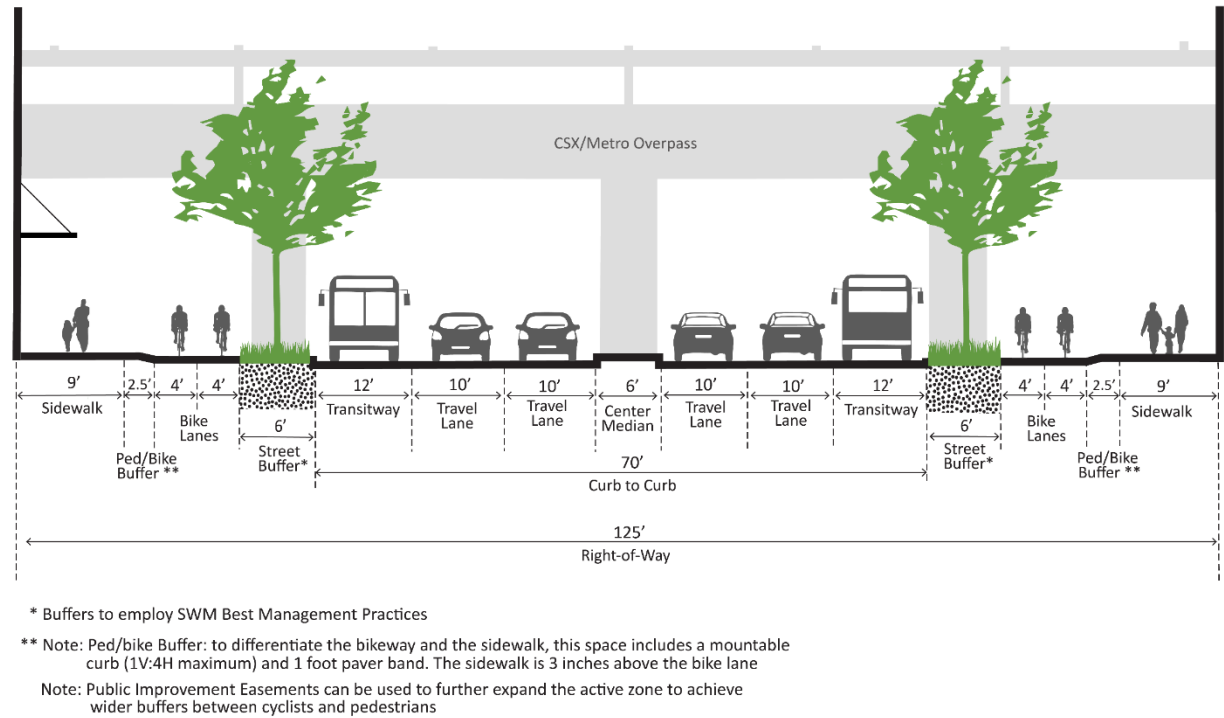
Colesville Road (M-20), Sarbanes Transit Center to East-West Highway, Looking North
